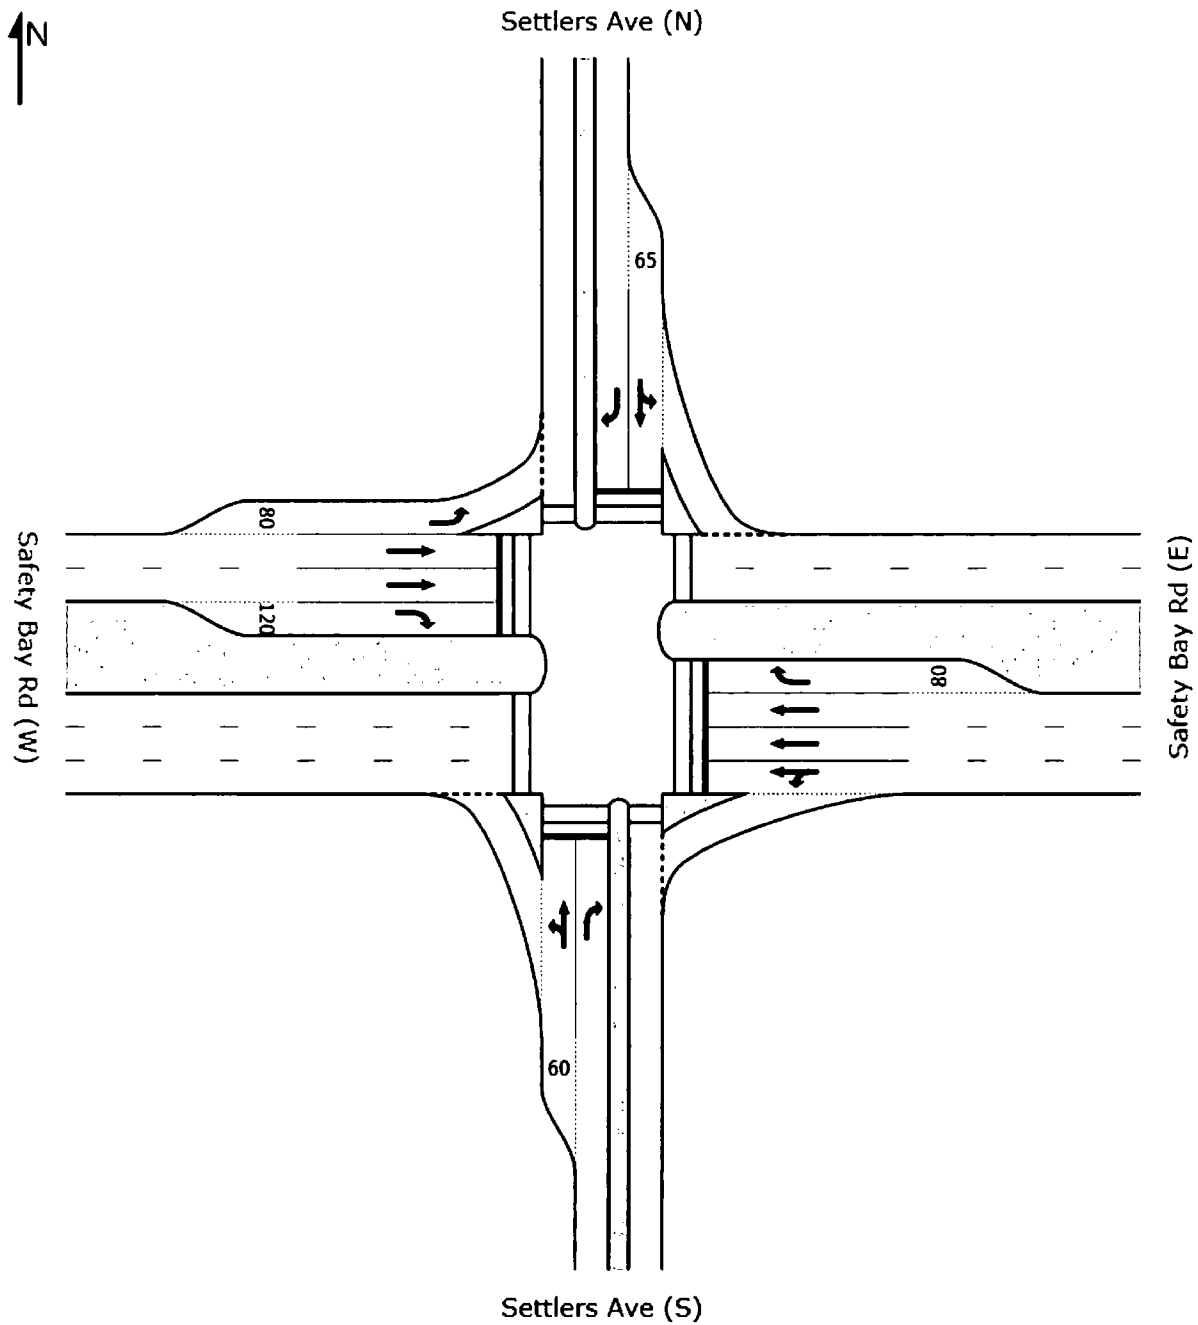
Safety Bay Road / Settlers Ave (4-way) intersection layout
